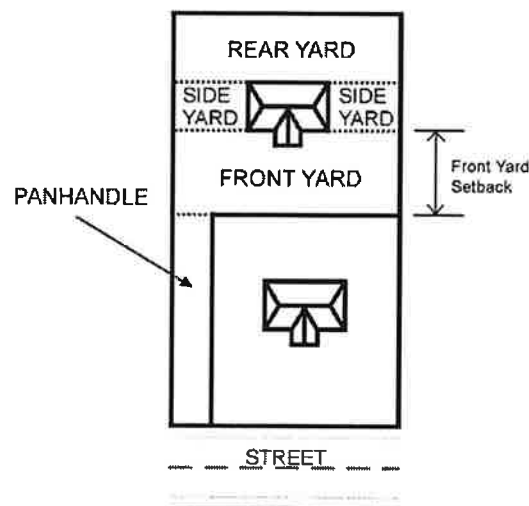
Yard and front yard setback locations on a panhandle lot.
